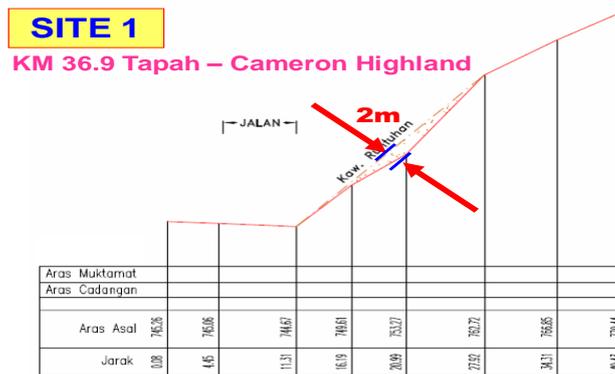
Shallow slope failure at Tapah, Cameron Highland: Site 1.
